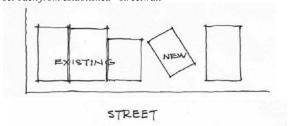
Inappropriate Alignment - skewed orientation of new infill building disrupts established "streetwall"
